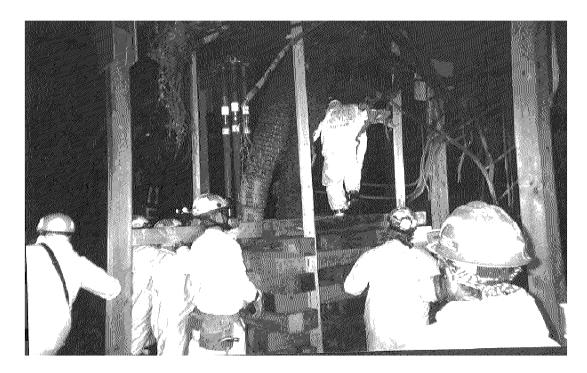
Crib shore at column 11D. Shoring Squad builds a 4 point crib shore around damaged column 11D.
